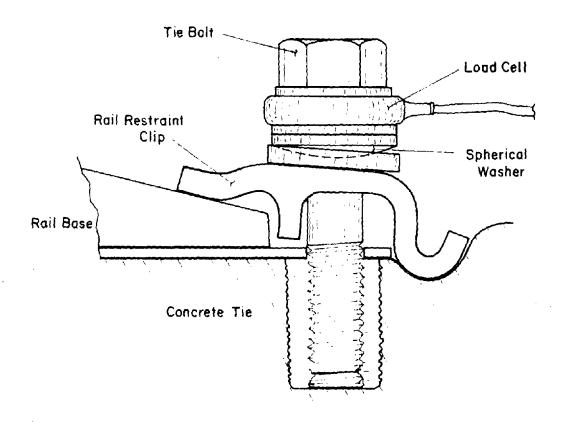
RAIL FASTENER BOLT LOAD MEASUREMENT
